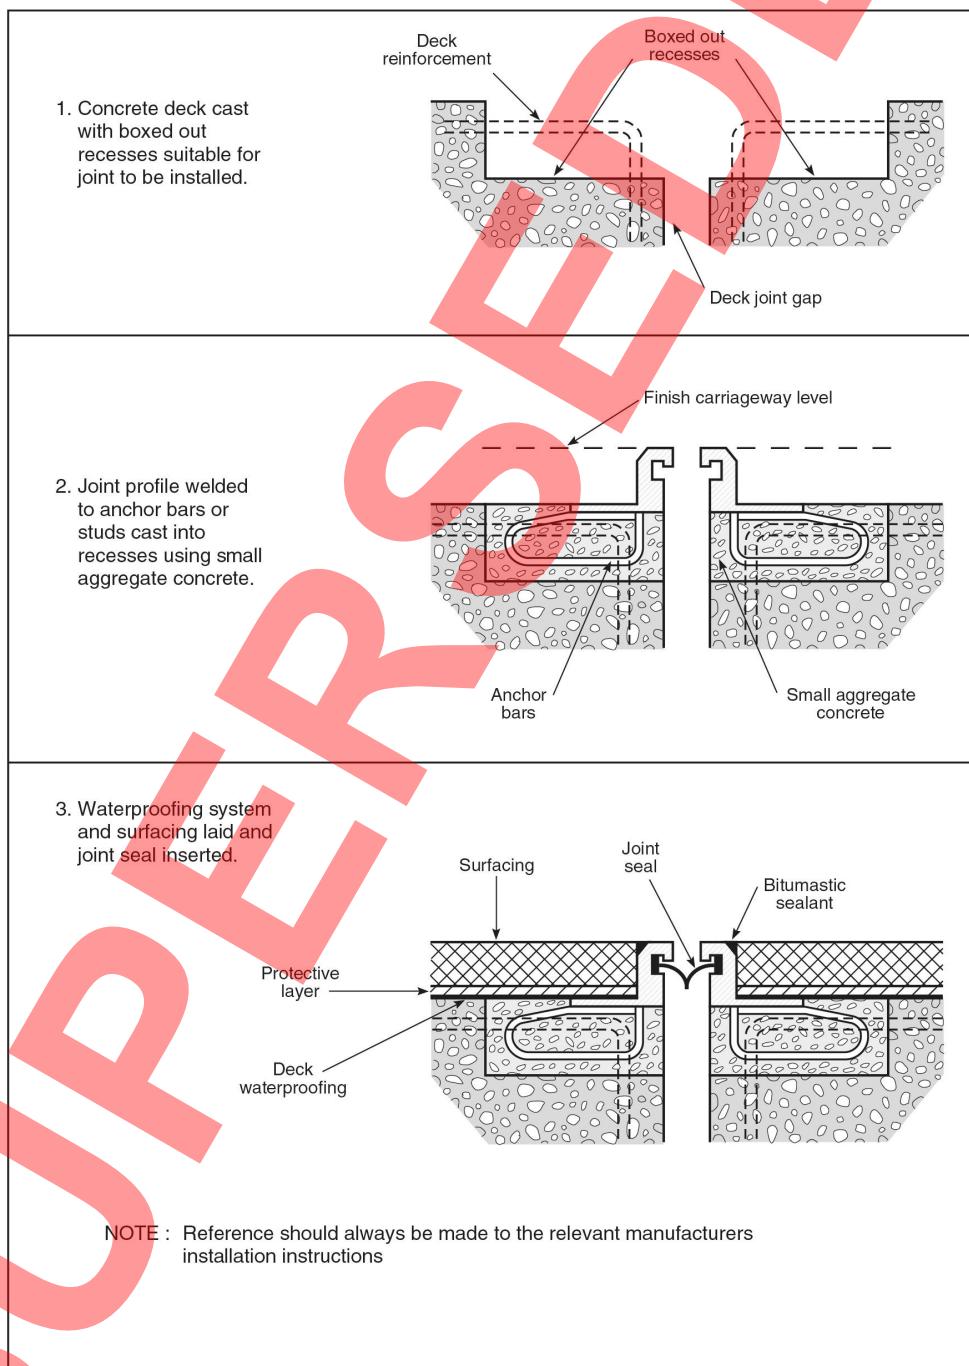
Typical installation procedure for joints fixed to deck using cast-in anchor bars or studs (single element modular joint shown)
